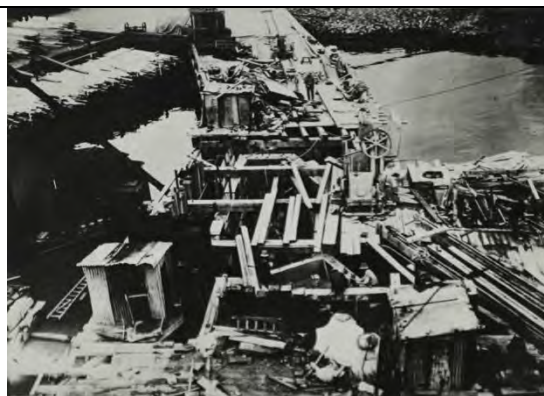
Cofferdam and formwork for the installation of conduits. State Rail Photos Series: 17420 Item: 364/48A SRNSW.
